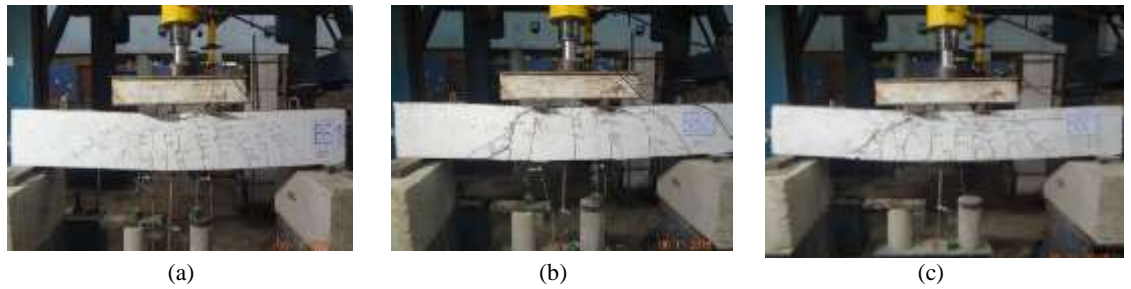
Crack Pattern and Failure Mode of Beams (a) BS, (b) BB, (c) BBF
